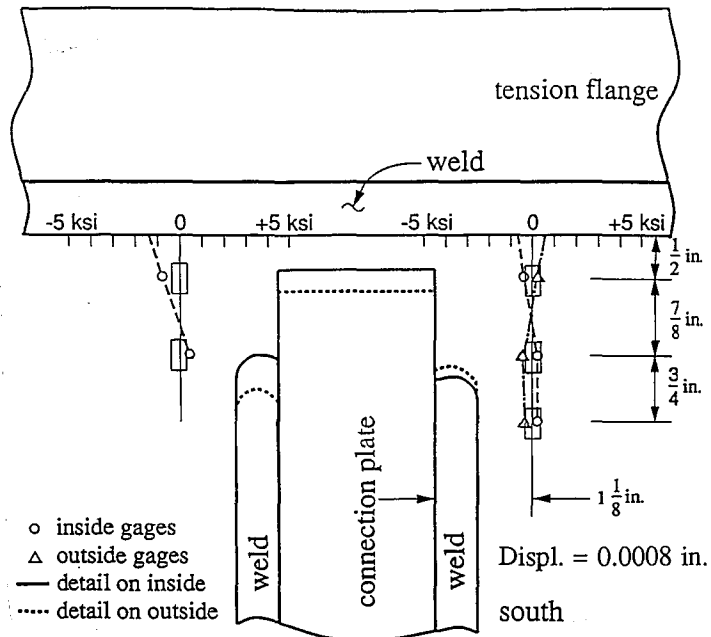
Static Stress Distribution on Inside Girder of Pier S7-9 (96 in. Girder) Before Retrofit with Lowboy in Outside Lane (Worst Case)
